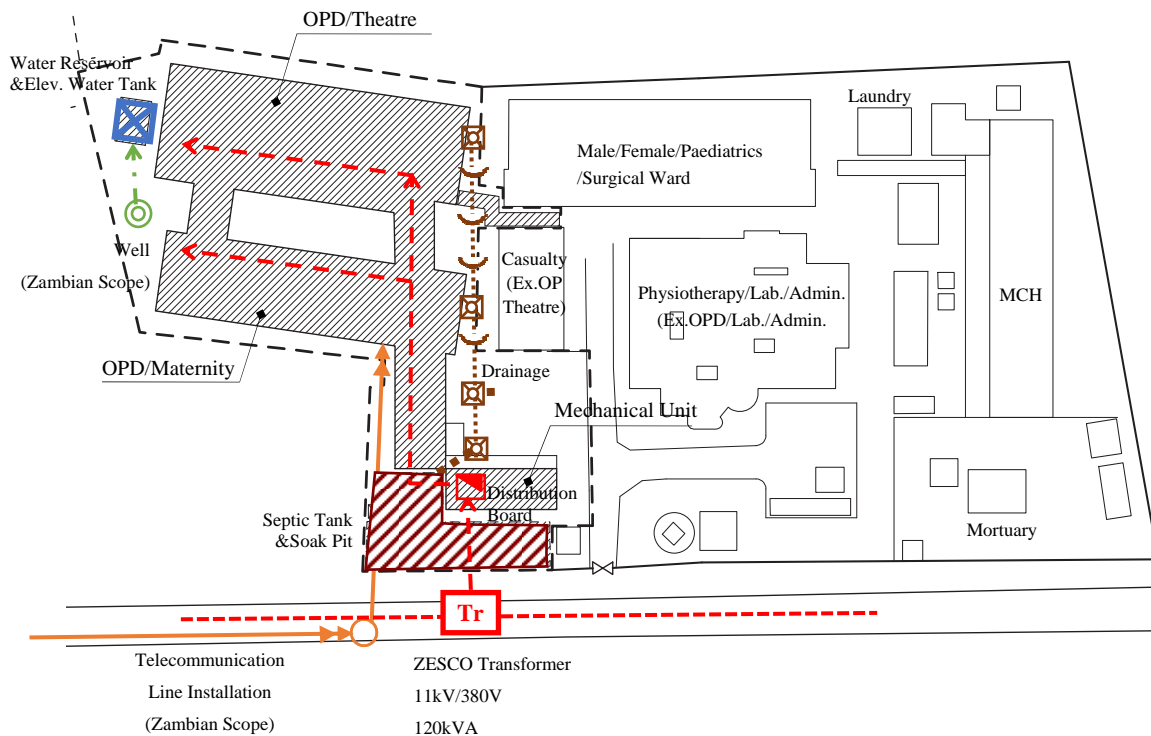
Chipata Lv1H Infrastructure Installation Plan
